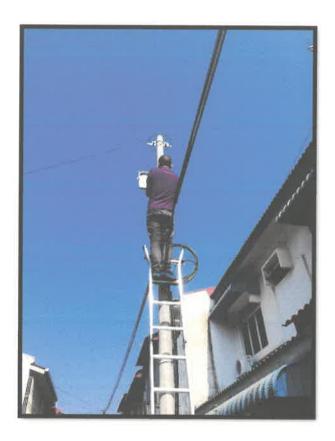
(a): Installation of fiber cable from the DP to the building
